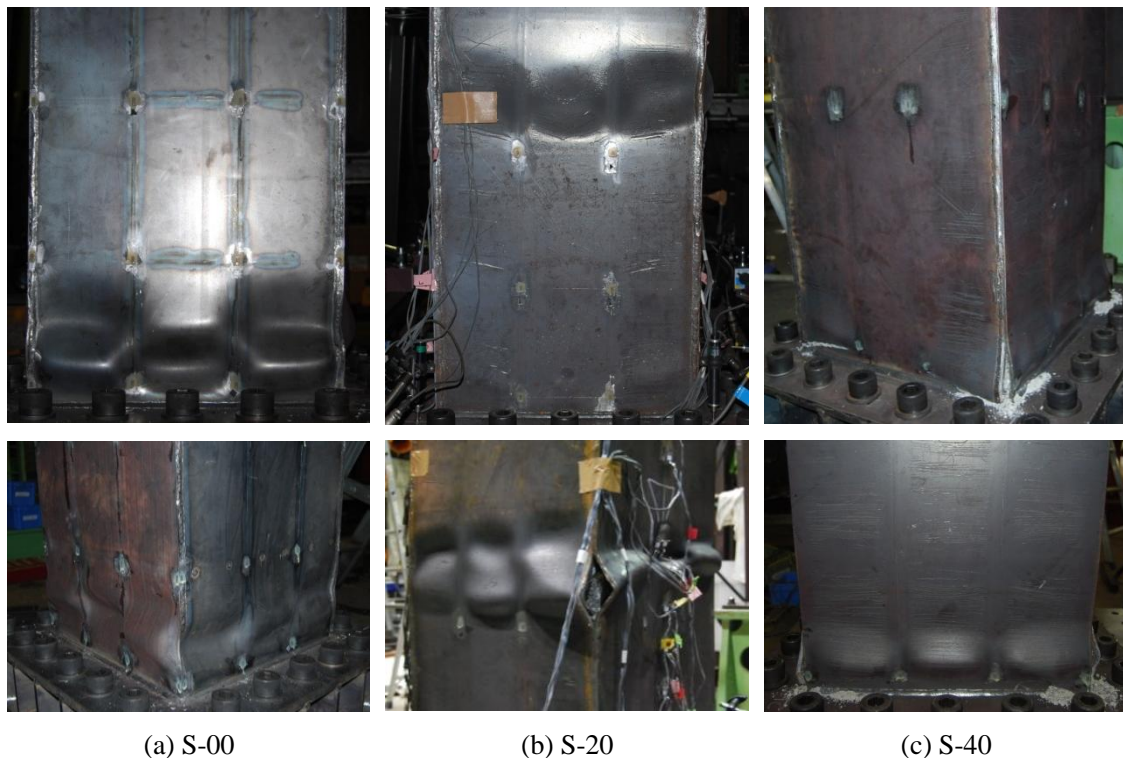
Failures of stiffened rectangular section specimens observed after static cyclic loading tests
